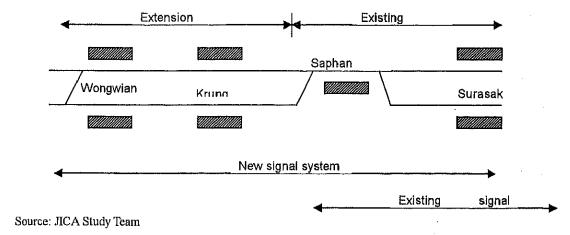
Track Layout of Extension Section of Silom Line
